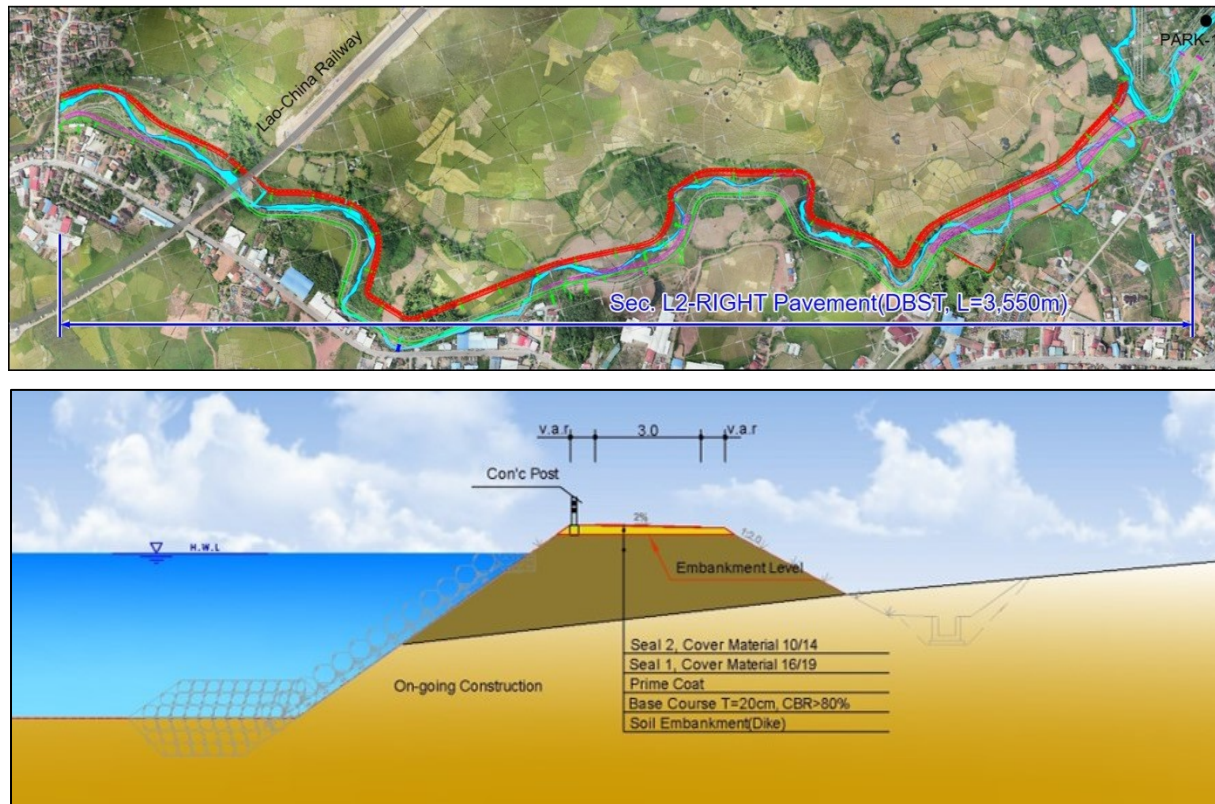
Location and Typical Cross Section for the Crest Pavement
